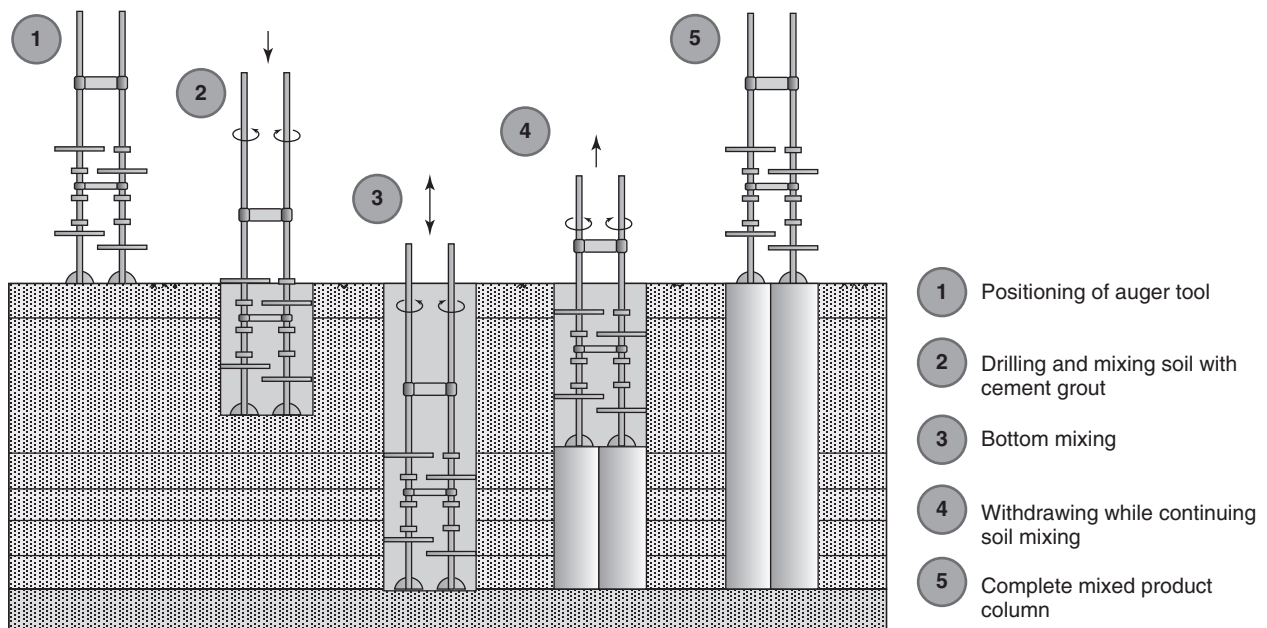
Example of SCM excavation support construction sequence. (Courtesy of JAFEC USA, Inc. Geotechnical Constructors)
